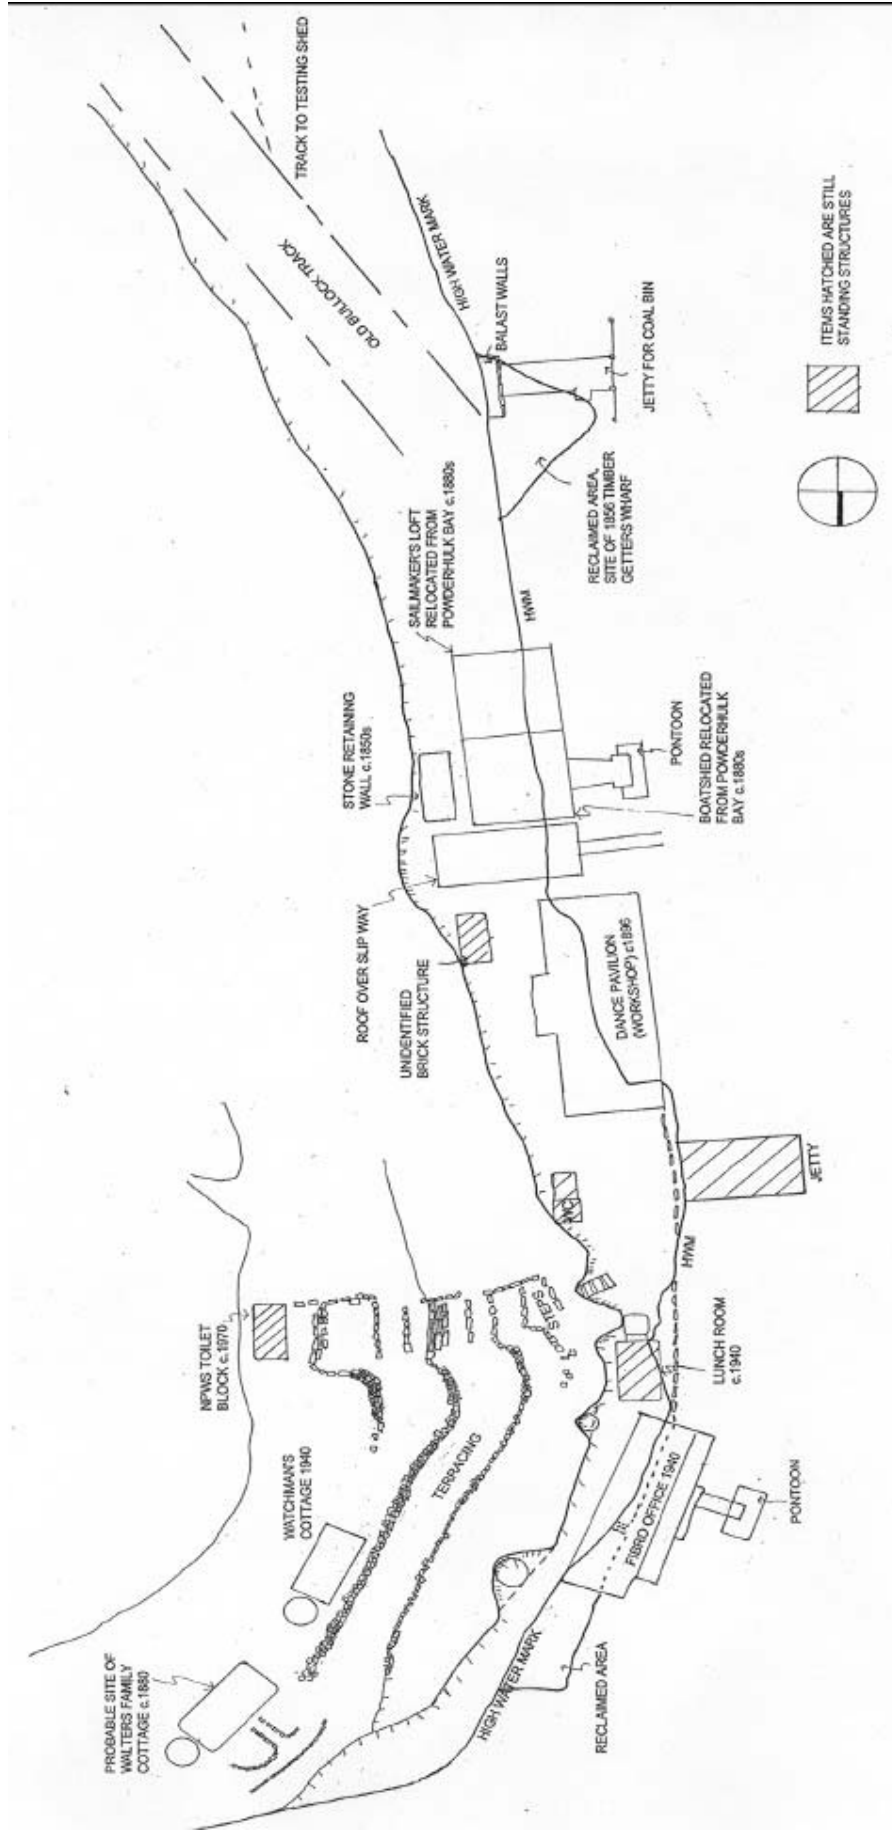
Plan of known features and buildings, Eastern Shore Bantry Bay. (Not to Scale)
